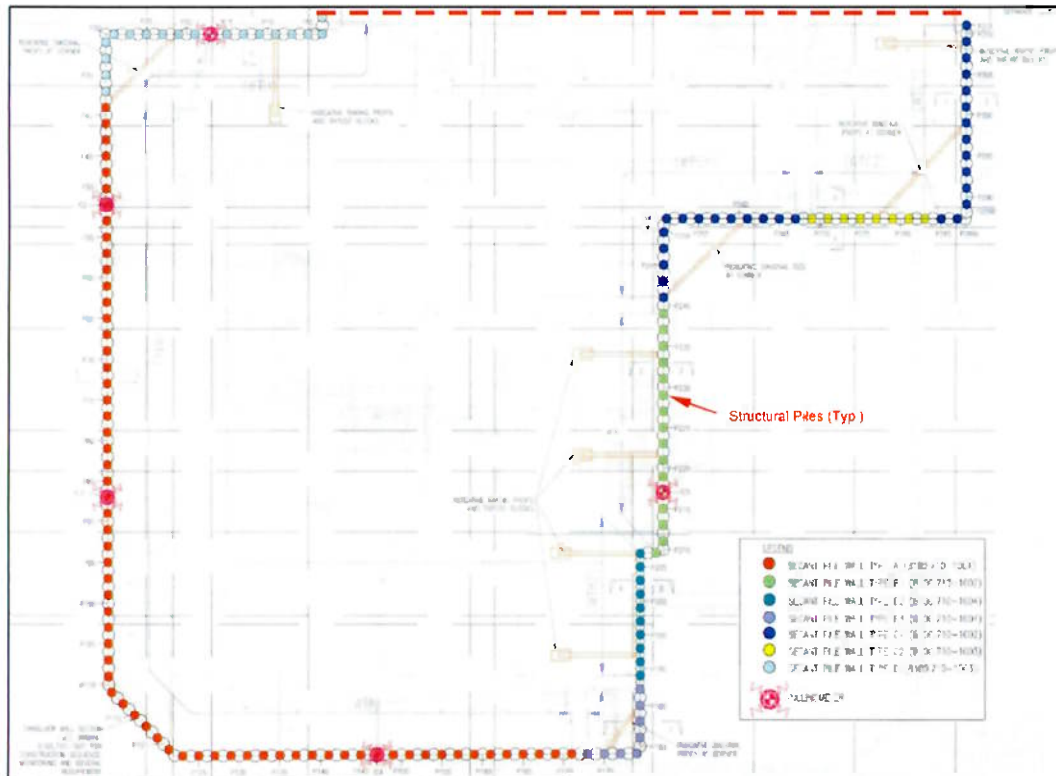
Tunnel alignment superimposed on plan of the basement and perimeter secant pile wall.
